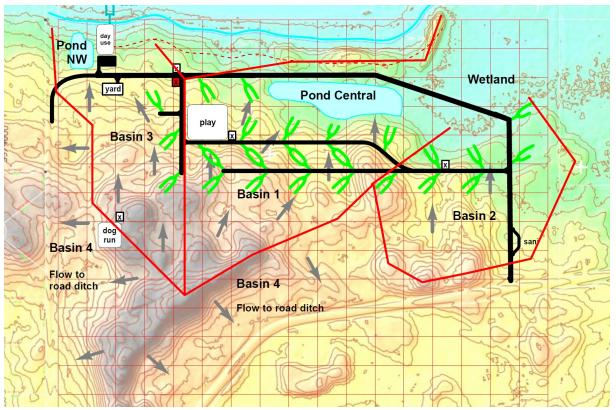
Figure 4 from the Stormwater management plan, identifying the drainage basins and stormwater management ponds on the property.
